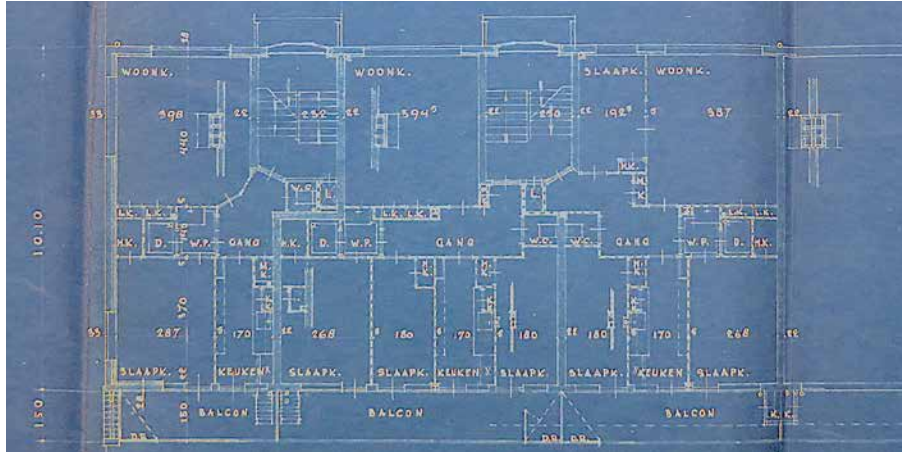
Floor plan for the AWP block at Bos en Lommer, dated 28 August 1939, with chimneys added in on plan in the lounge (“woonk.”) and a coal hopper on the balcony (SAA: BWT/1990_2000/373 (8582)).
